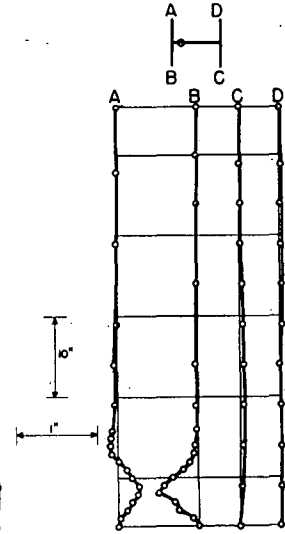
Carbon steel specimens loaded at kern point. Profiles of flanges of columns after failure.
